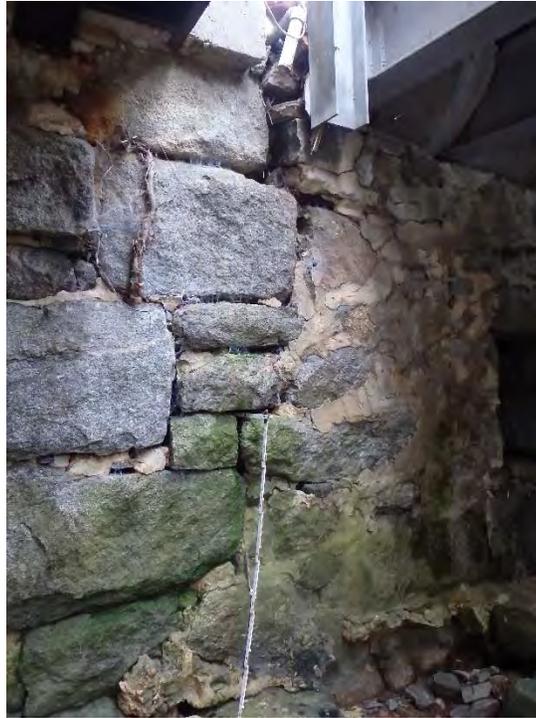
Elevation of East Half of Section 10, Looking Northwest.
